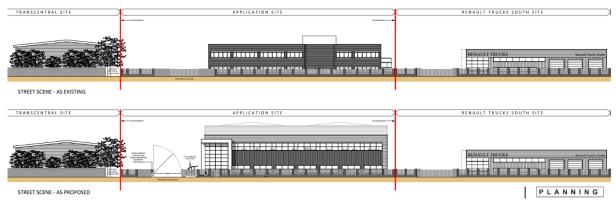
Existing and proposed streetscene elevations along Bennet Road.
